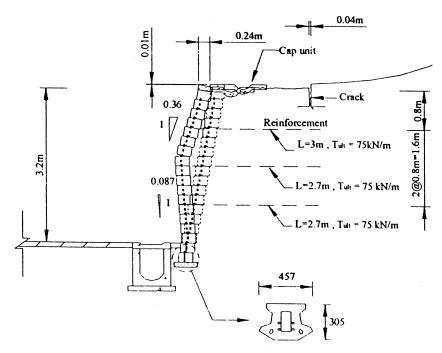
Large deformations at the geosynthetic reinforced modular block wall (Huang 2000)
